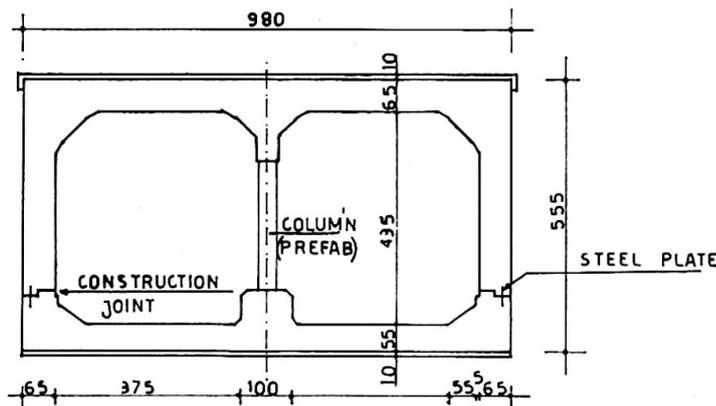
Cross-section of subway tunnel element Rotterdam.
